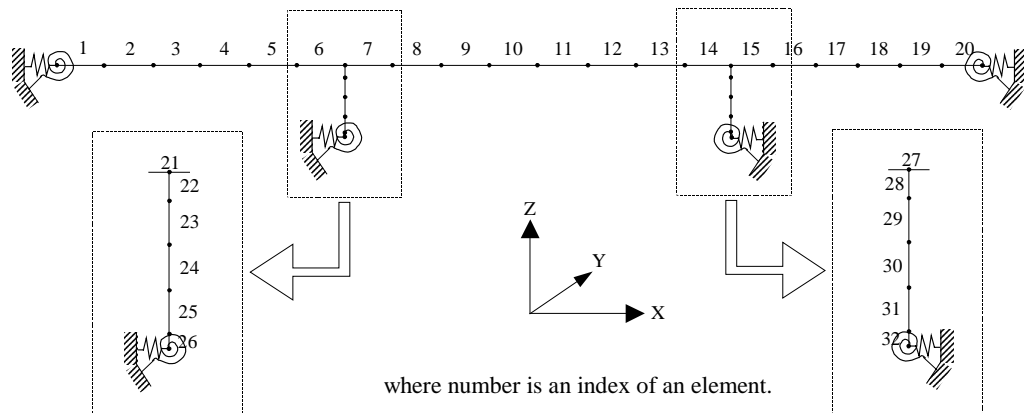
Finite Element Model of Jamboree Road Overcrossing
